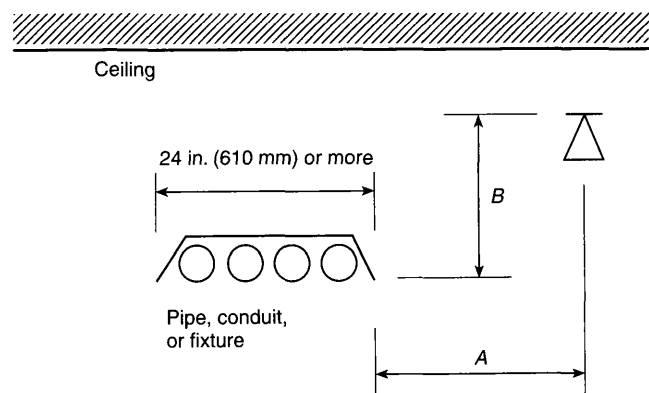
Obstruction Entirely Below the Sprinkler (Large Drop Sprinkler).
